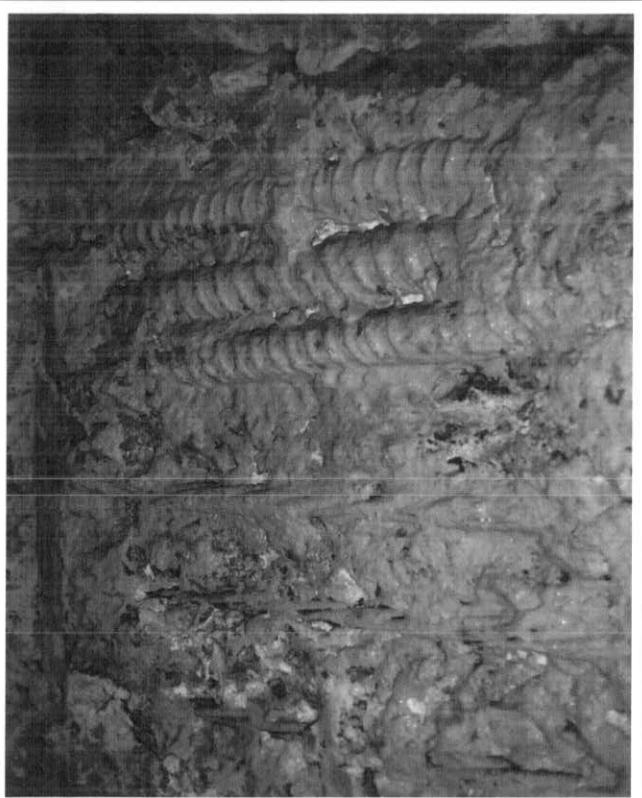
CLOSEUP OF VISIBLE STRANDS ON LEFT SIDE BOTTOM OF GIRDER # 8 IN SPAN # 2 AT ABUTMENT # 2.
